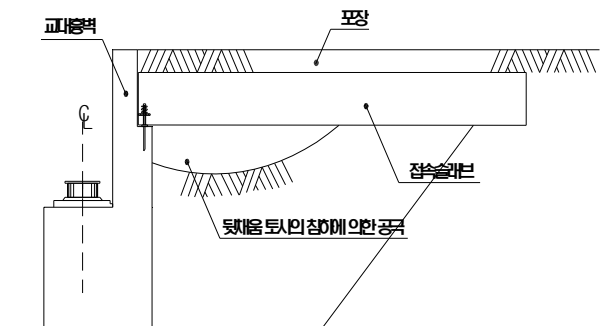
Typical Approach Slab System in the Asphalt pavement
